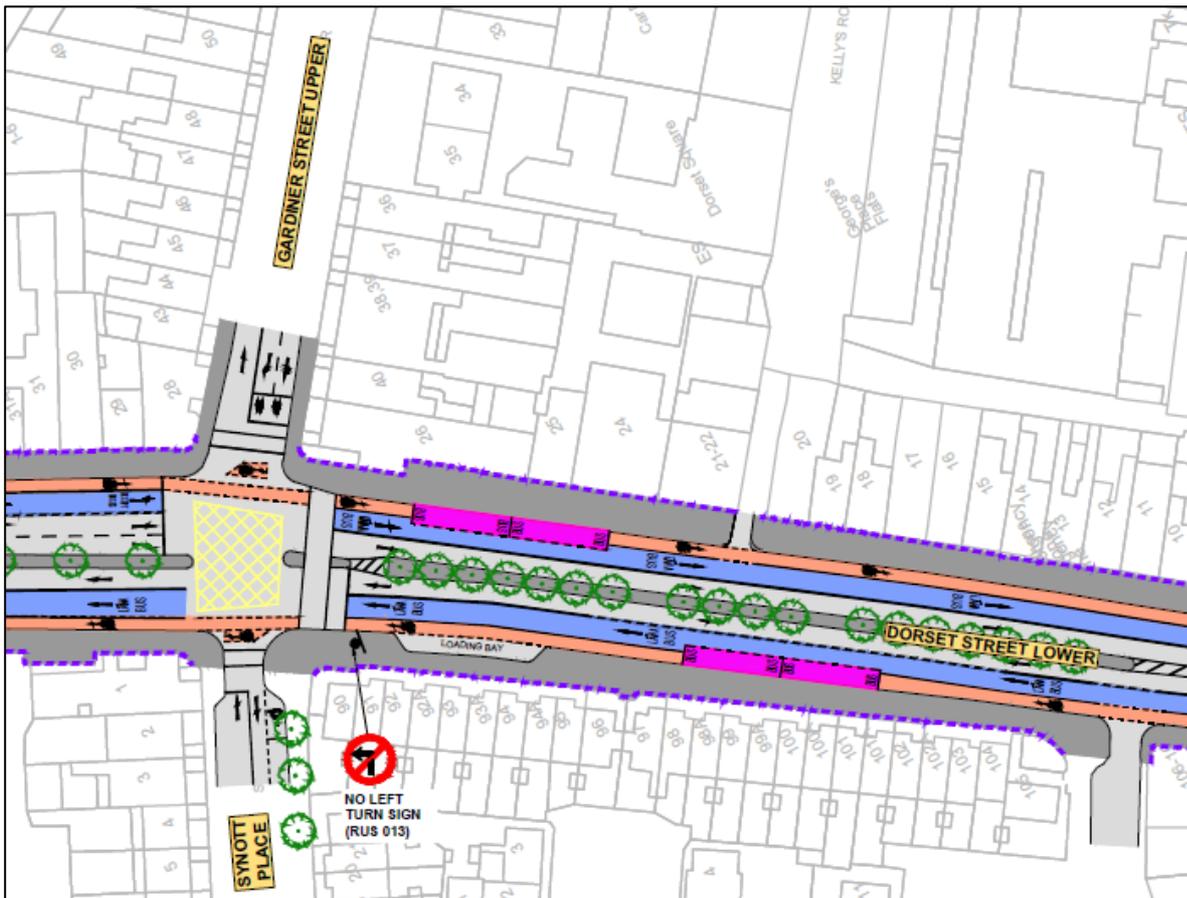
Gardiner Street Upper/Synott Place to Hardwicke Place/Eccles Street
